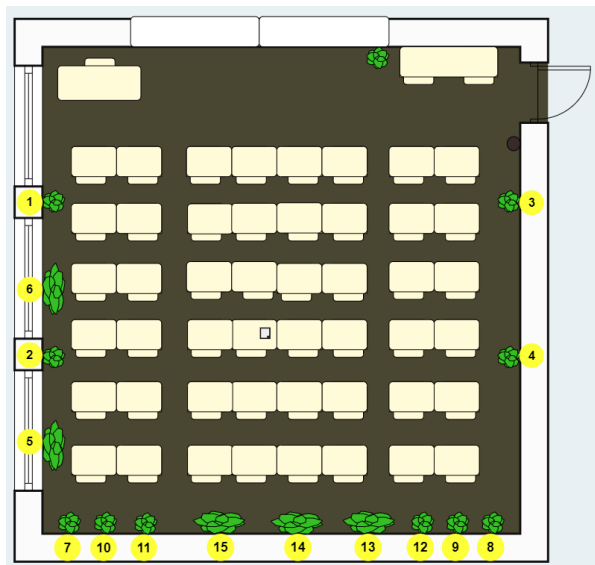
Green Room plan with indication of the plants placement and the Indoor Air Quality measuring device, in the center of the room
